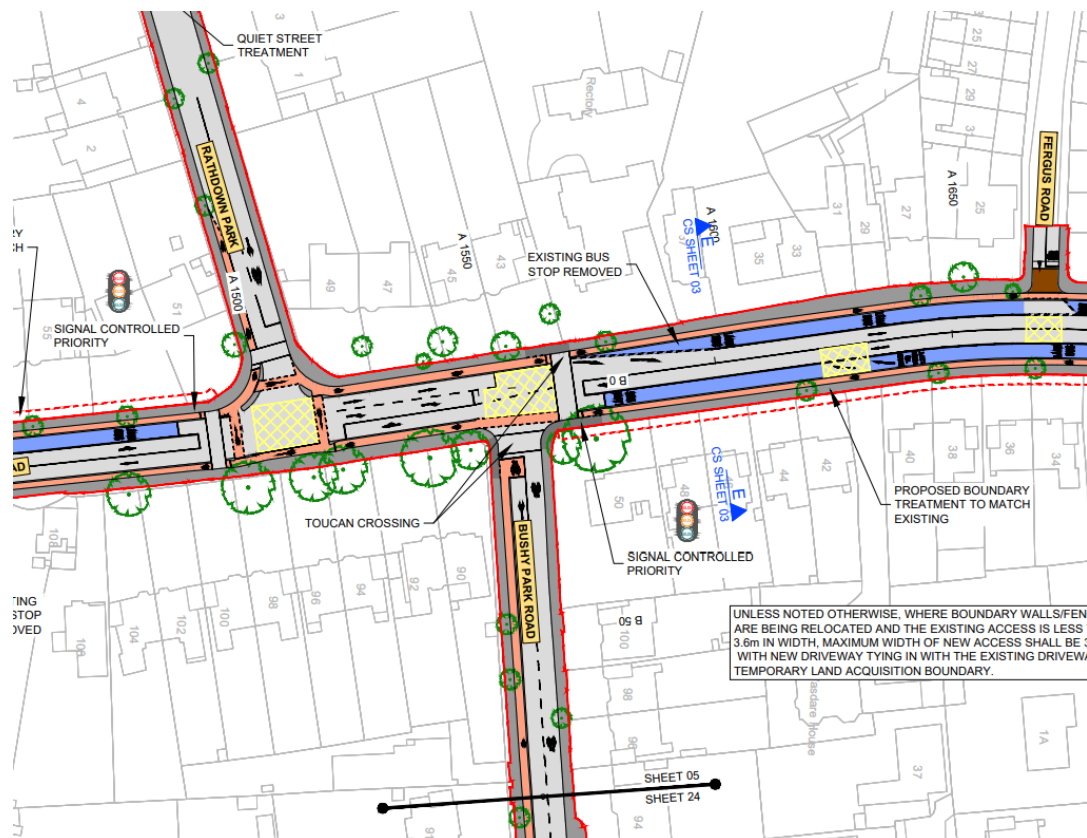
Extract from General Arrangement drawings showing layout at Bushy Park Road
